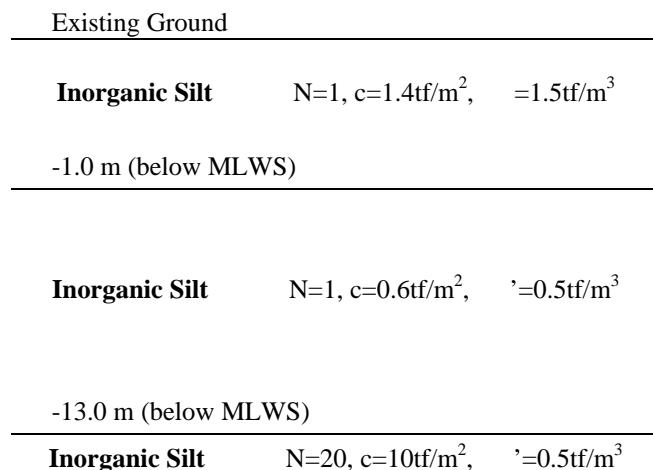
Typical Subsoil Conditions at Land Side
